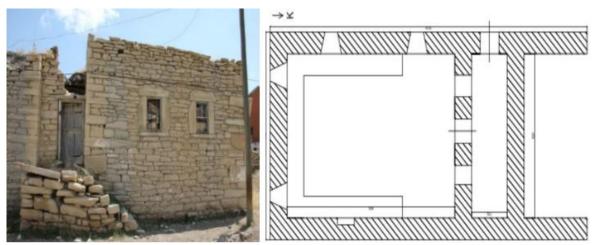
Erzincan-Çayırlı-Başköy Kaya Koçgil's Village Room, Left: General View of the Room, Right: Plan of the Room (Naldan, 2020).
